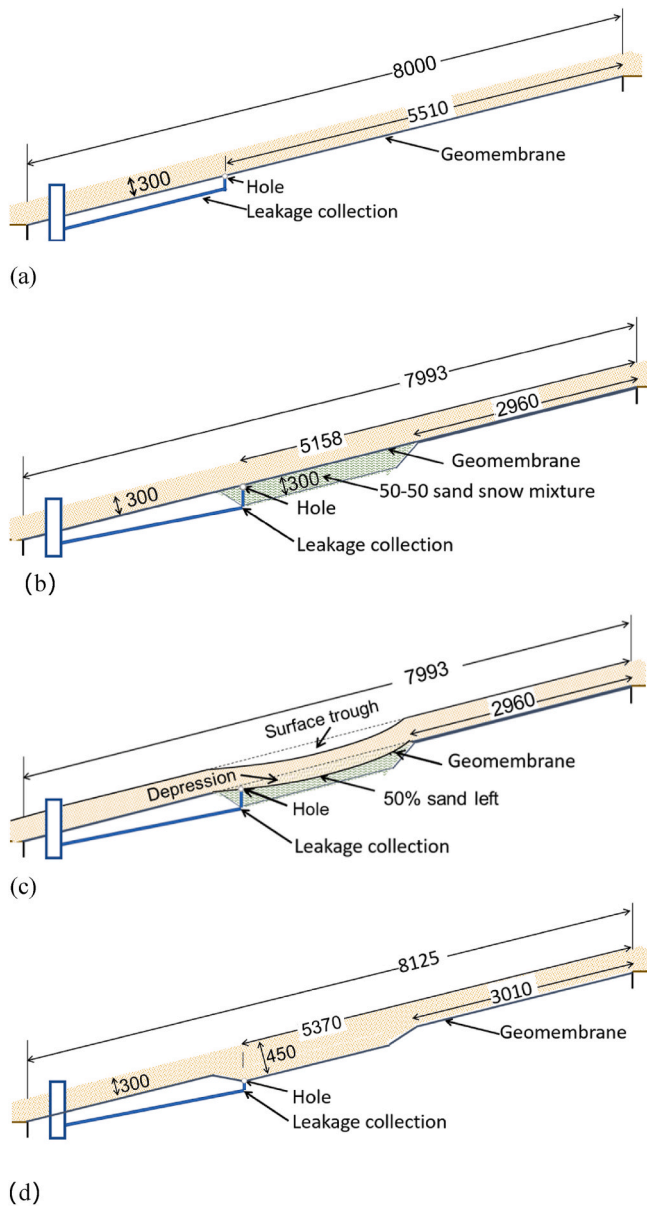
Cross sections of the field GMB leakage experiments: (a) Section A; (b) Section B initial condition; (c) Section B after snowmelt; (d) Section C.
